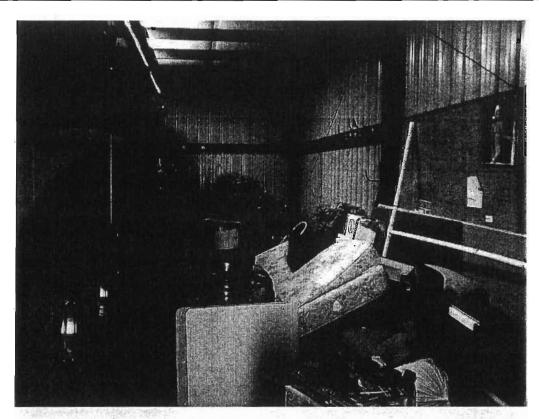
View of the interior of on-site building utilized for storage of owner's items and restaurant equipment.
